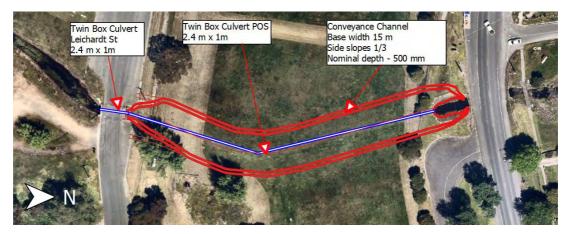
Propose upgrade to culvert configuration at Leichardt Street, beneath POS and conveyance swale
